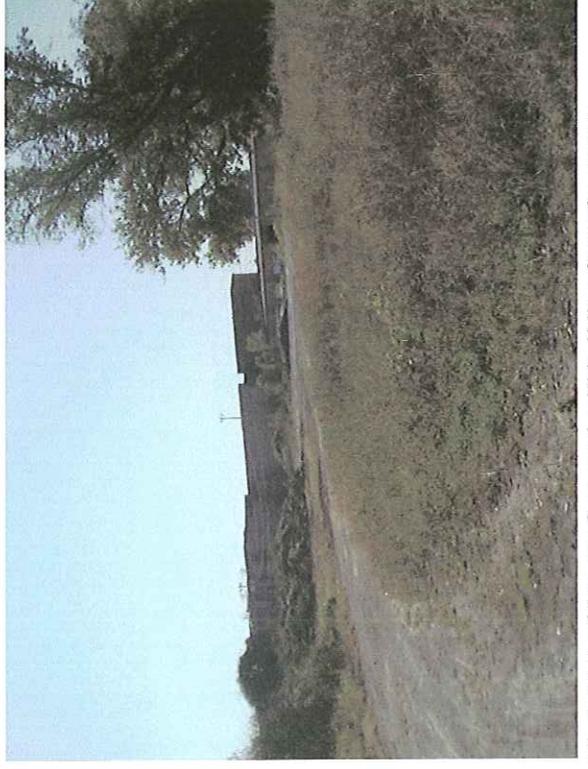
Looking south toward mill building from the access driveway near the northeast corner of the Frito-Lay land parcel.
